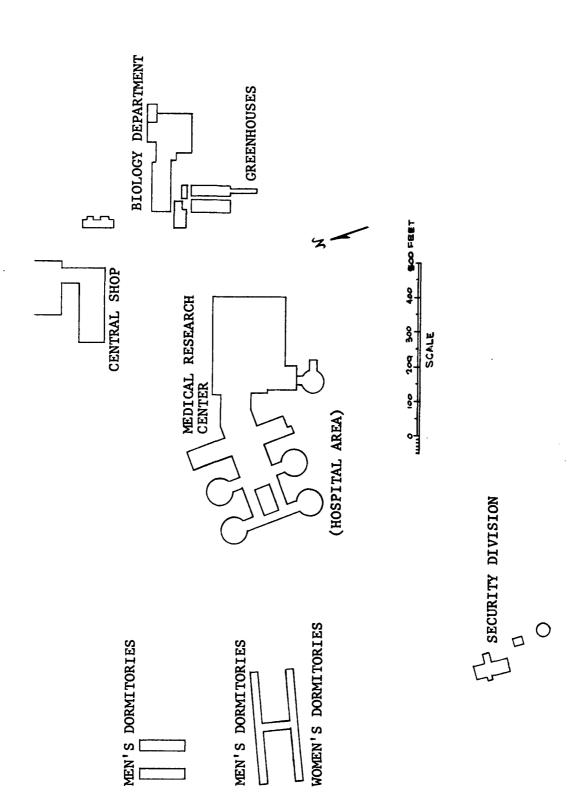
Plan view of building showing layout of surrounding structures.
